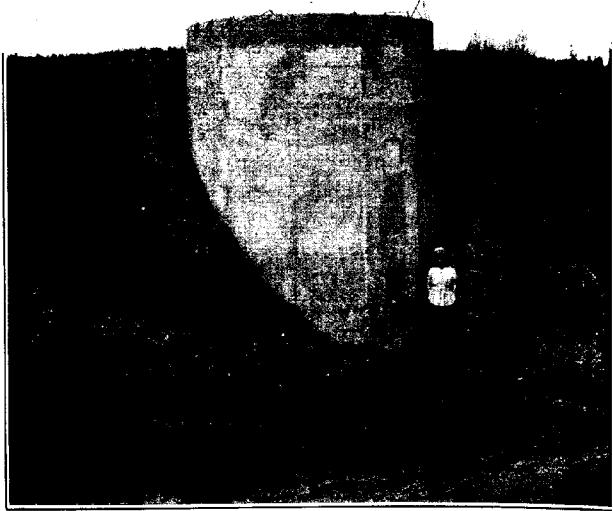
Reinforced Concrete Pit Grain Silo at Brundon.
